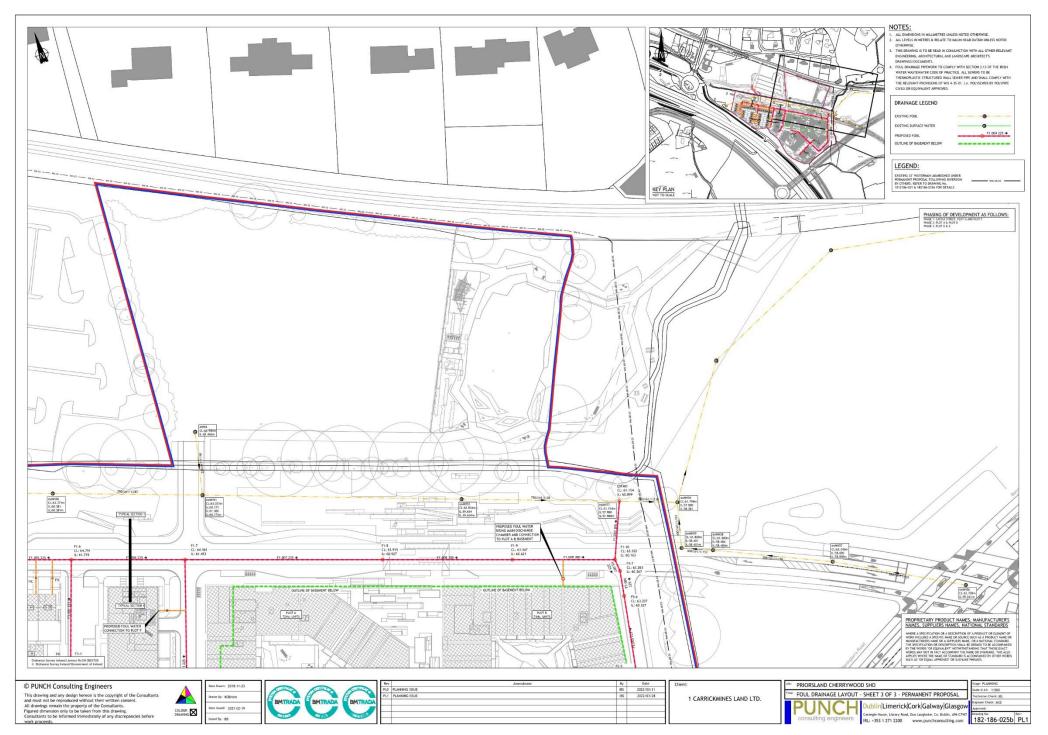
Foul water drainage – Permanent Proposal (sheet 3)
